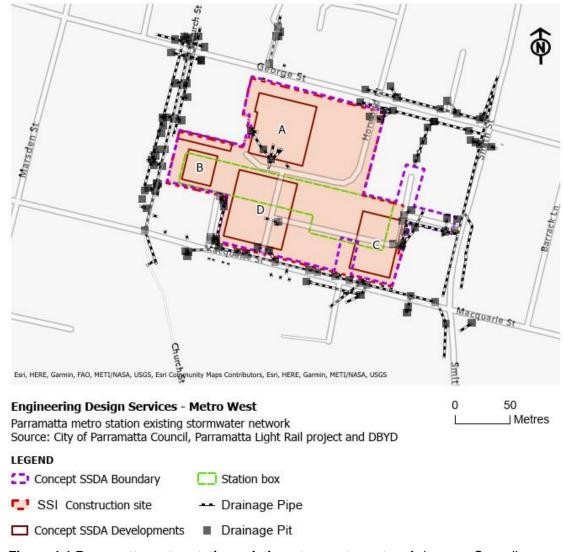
Parramatta metro station existing stormwater network (source: Council maps and DBYD)
